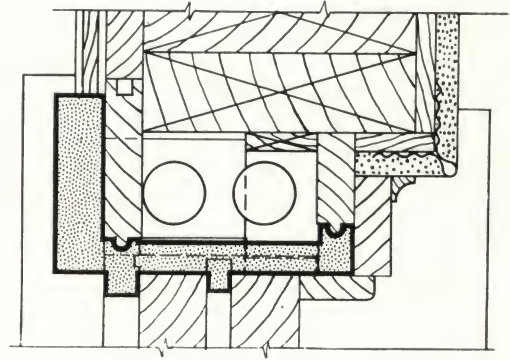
Standard jamb in 6" studding wall with plaster reveal and narrow trim.
